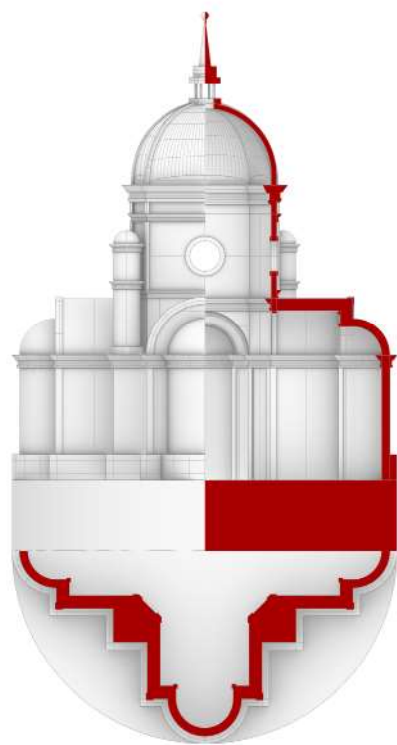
Plan, section and elevation (1:500) of the solution with a smaller diagonal side of the drum and an umbrella dome.
